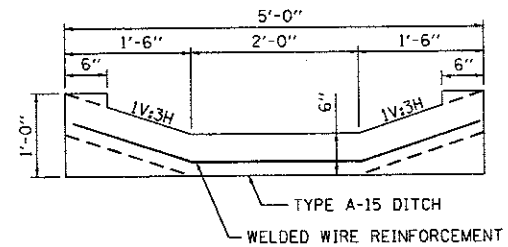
PARTIAL PAVED DITCH PLAN AT DRAINAGE STRUCTURES
